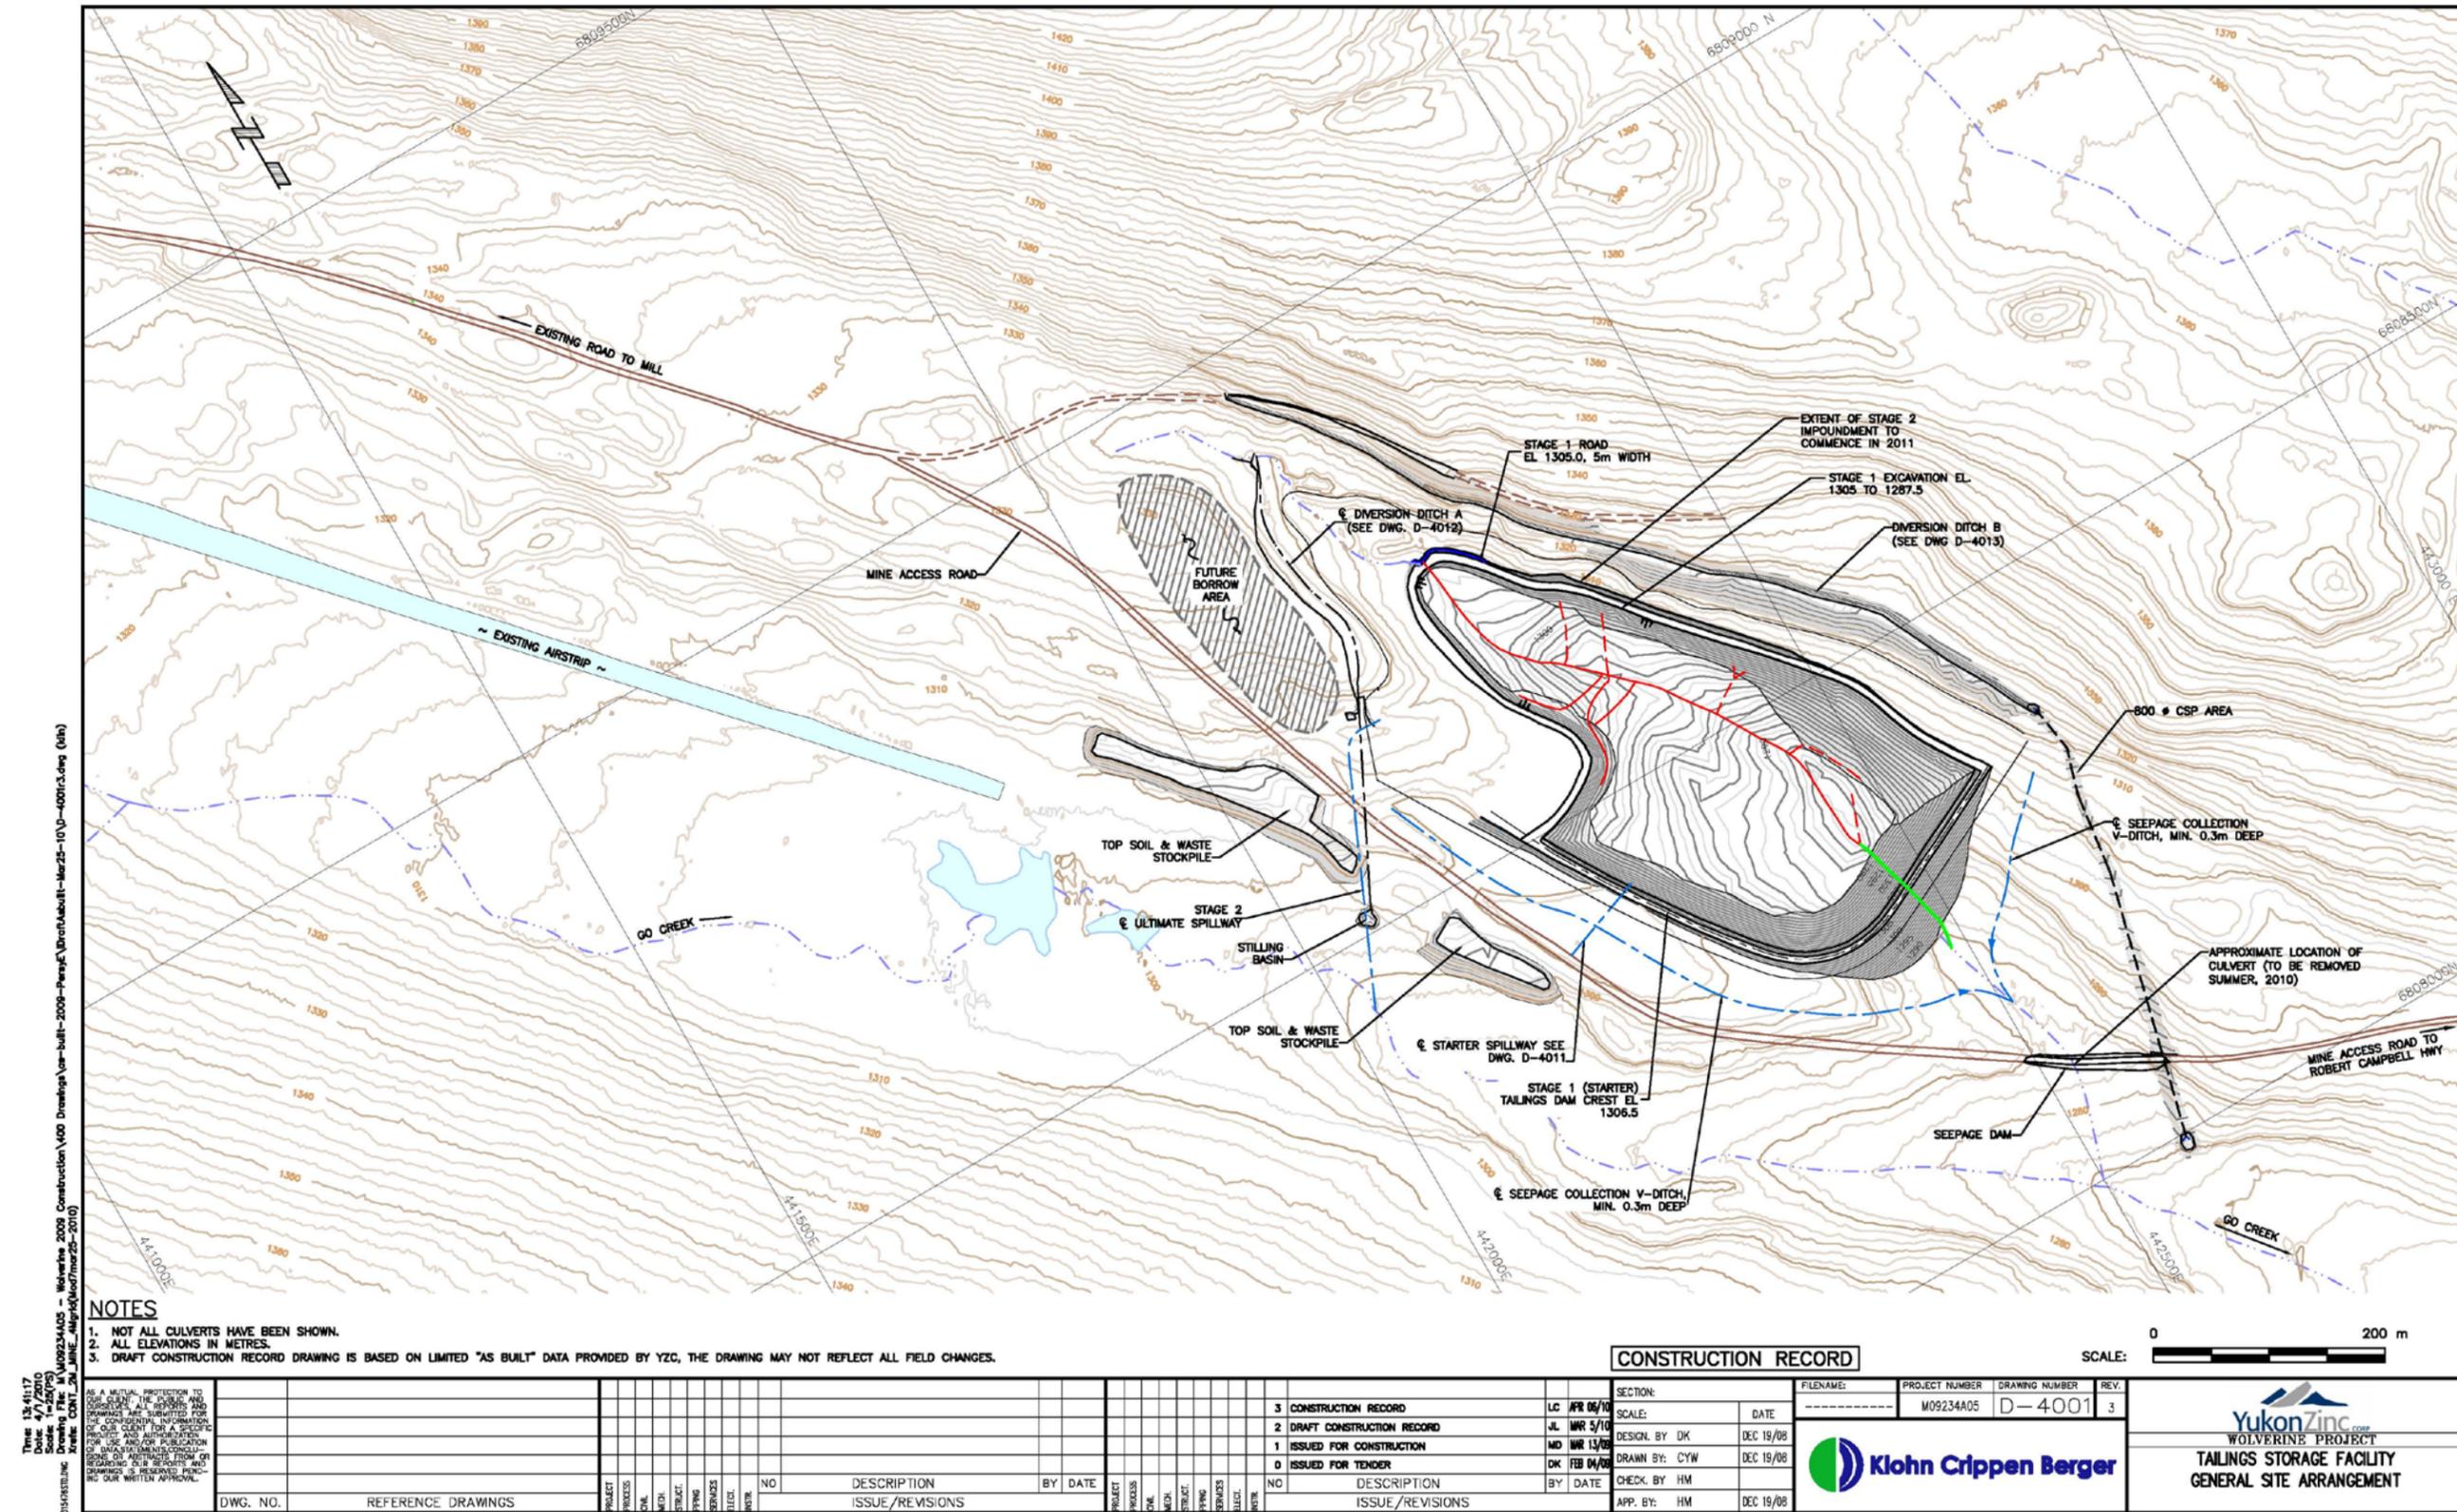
General Site Layout – Airstrip and Tailings Facility
